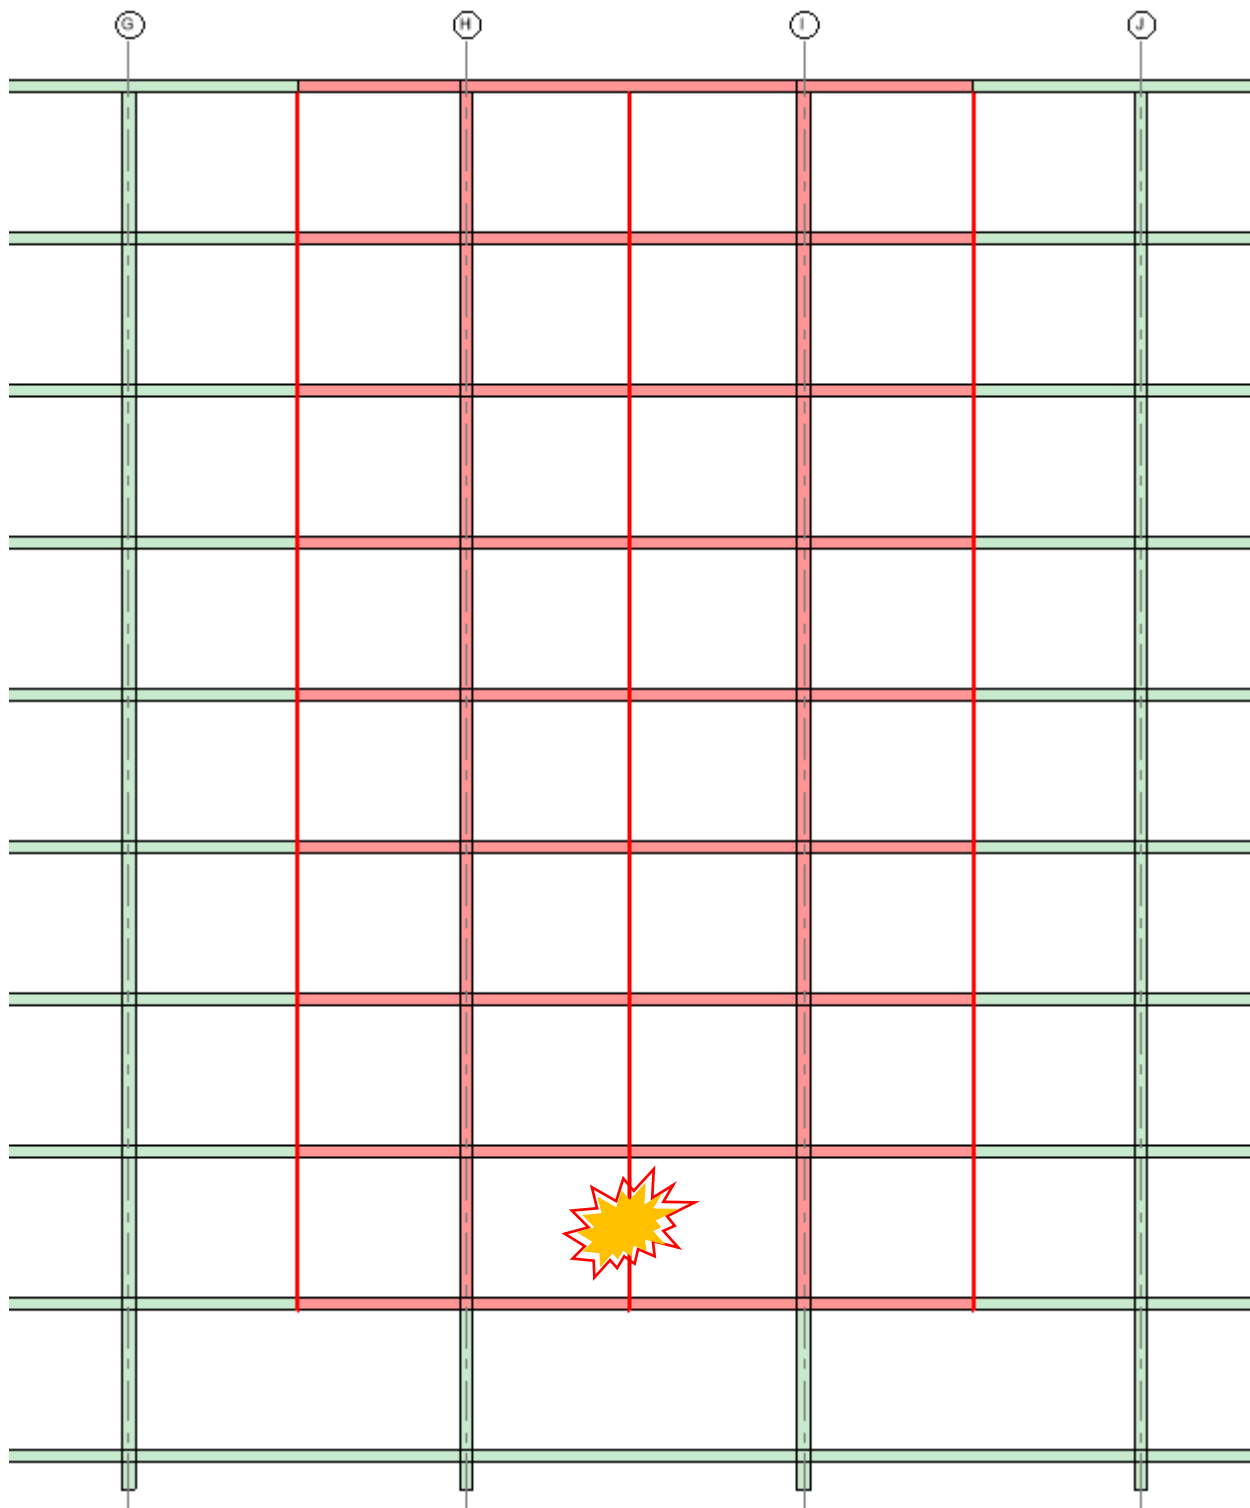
Collapse mechanism if explosion event occurs within an internal flat, Haviland & John Cozens house (elevation)
